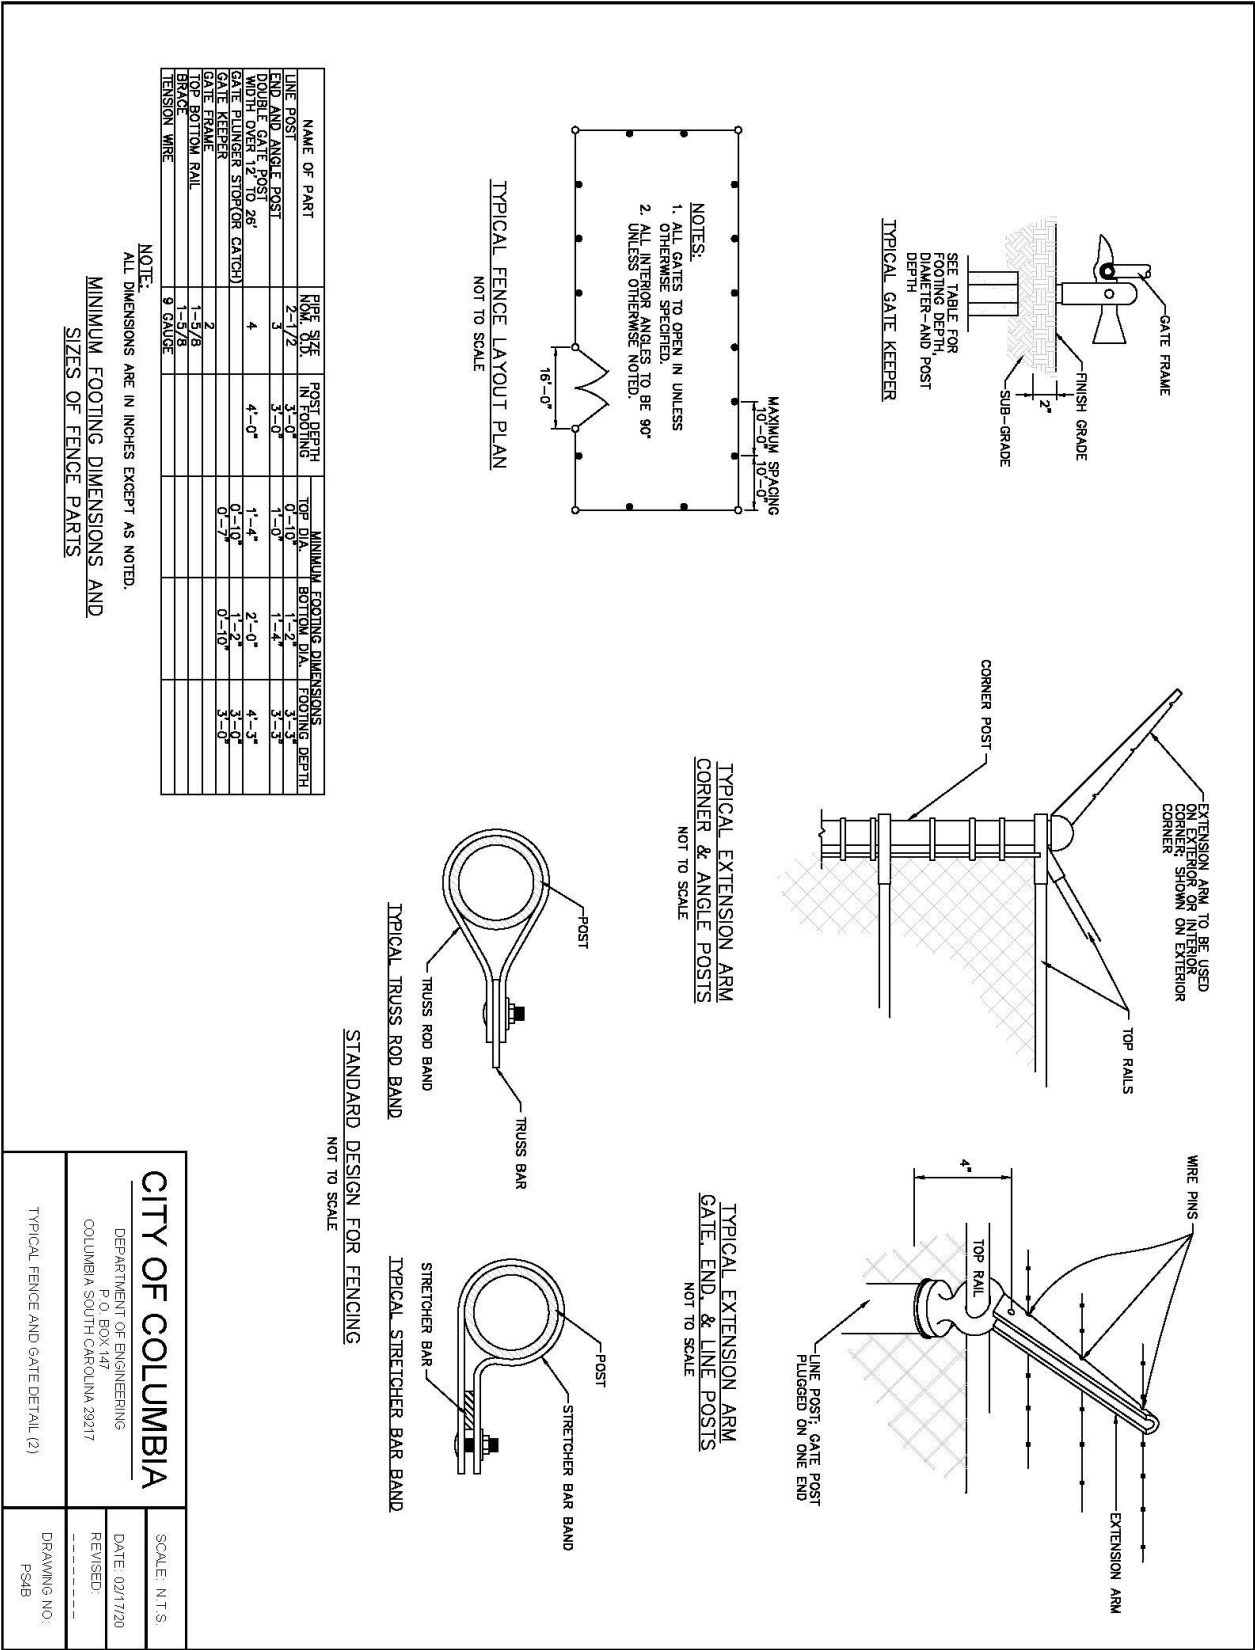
PS4B - Typical Fence and Gate Detail (2)
